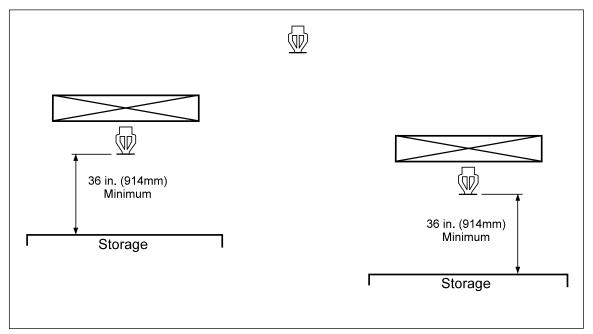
Flat, horizontal solid obstructions below sprinklers wider than 2 ft (610 mm).
